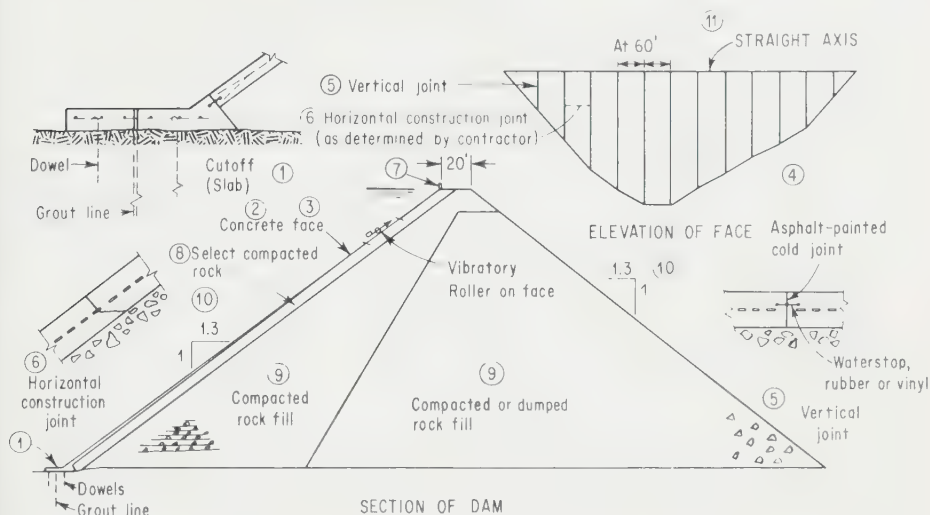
Typical recent design of concrete-face rock-fill dam.
